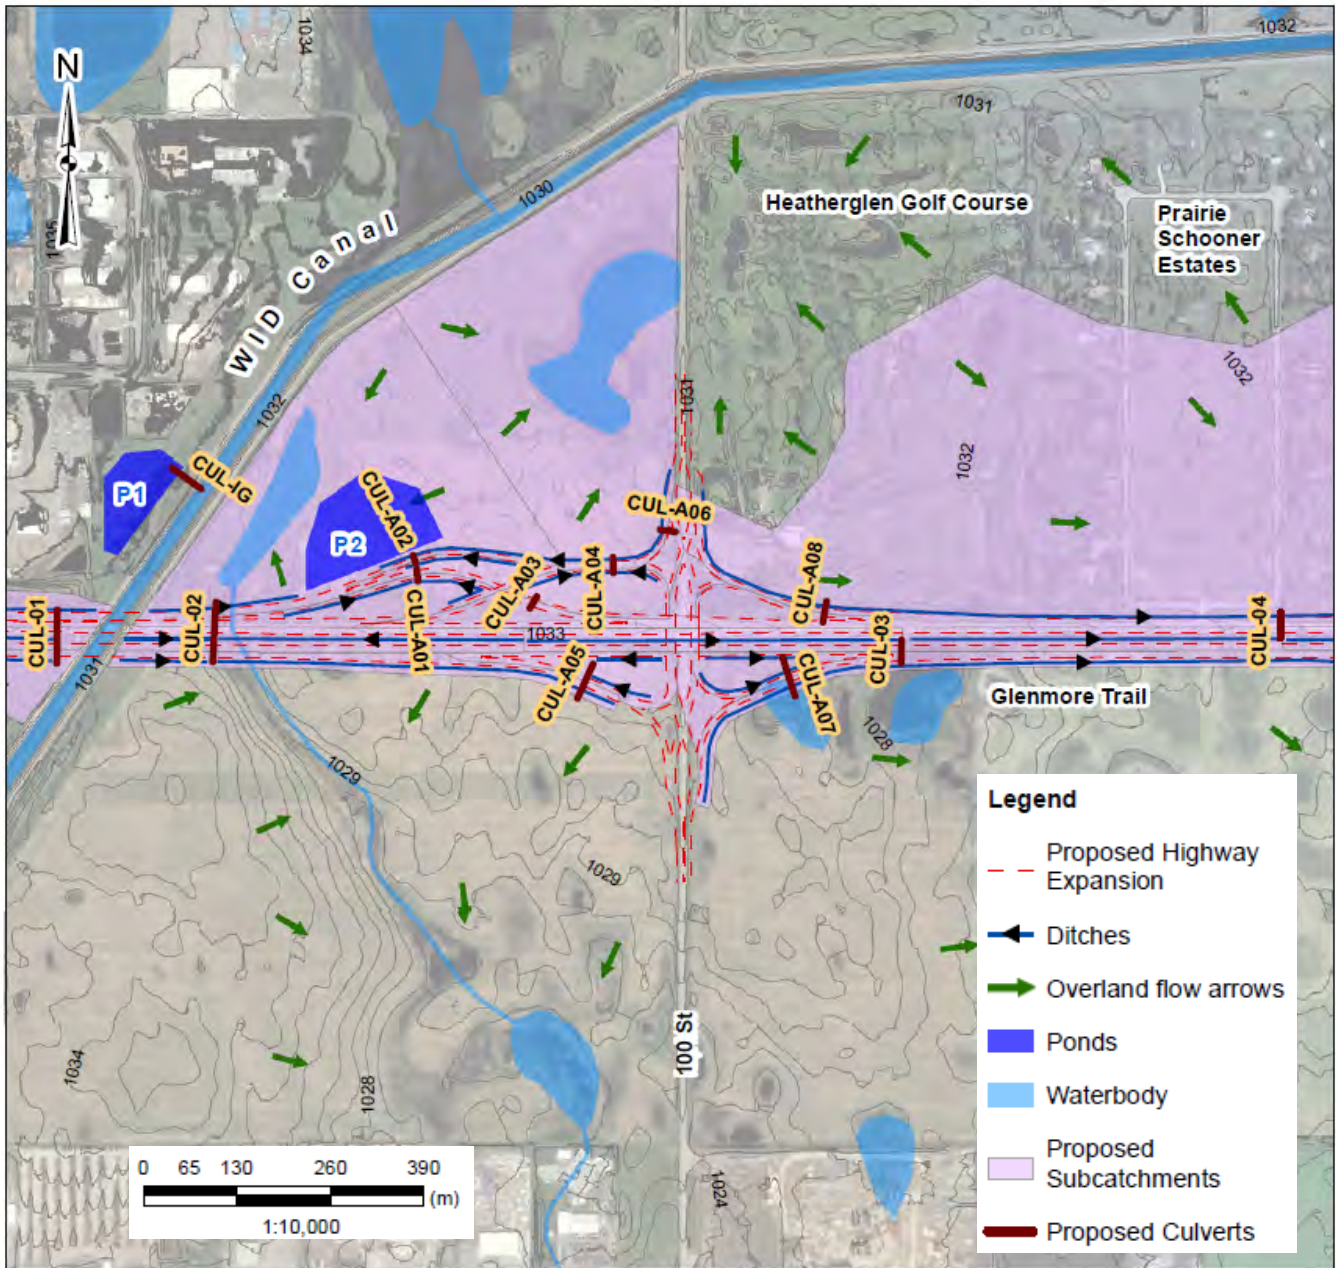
100 ST SE INTERCHANGE AND BASKETWEAVE STORMWATER AND DRAINAGE PLAN
